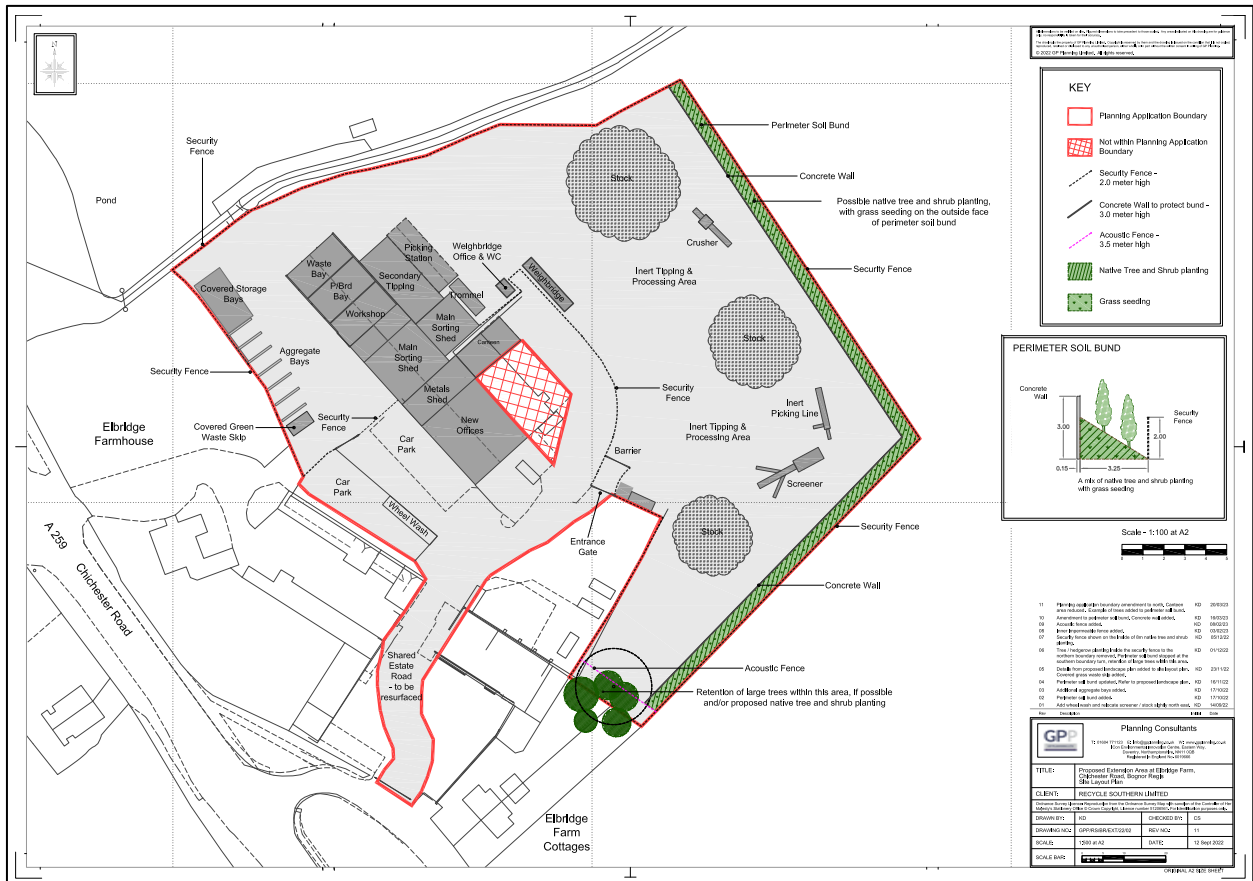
The proposed development layout plan for Elbridge Farm Recycling Centre. Plan courtesy of GP Planning Ltd; dated 20th March 2023 (drawing number GPP/RS/BR/EXT/22/02-11).
